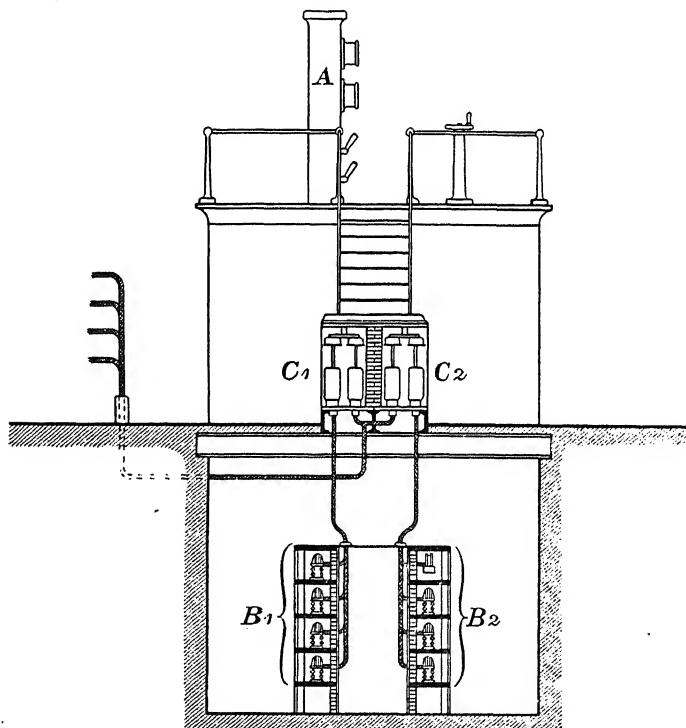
Section showing general arrangement of Niagara switchgear.
